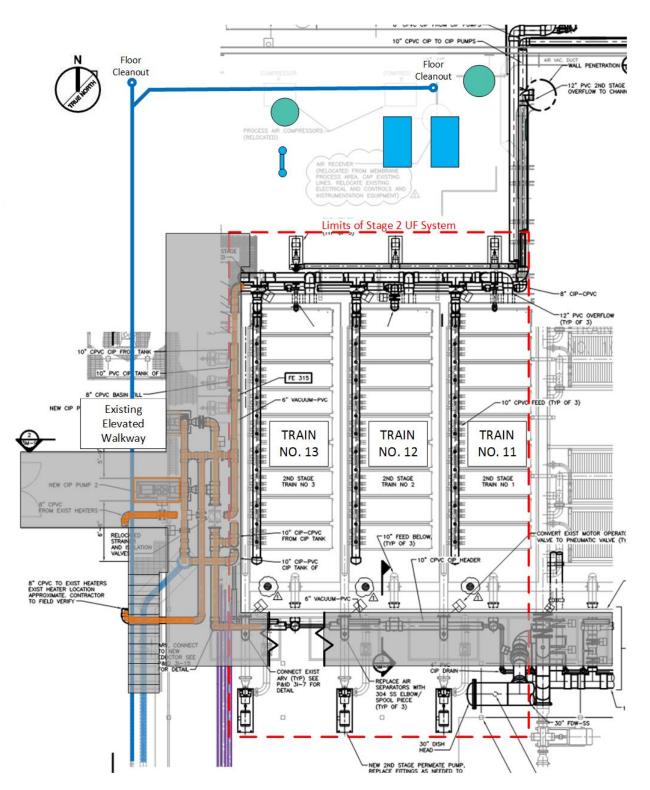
Existing Stage 2 Trains, Upper Plan View
